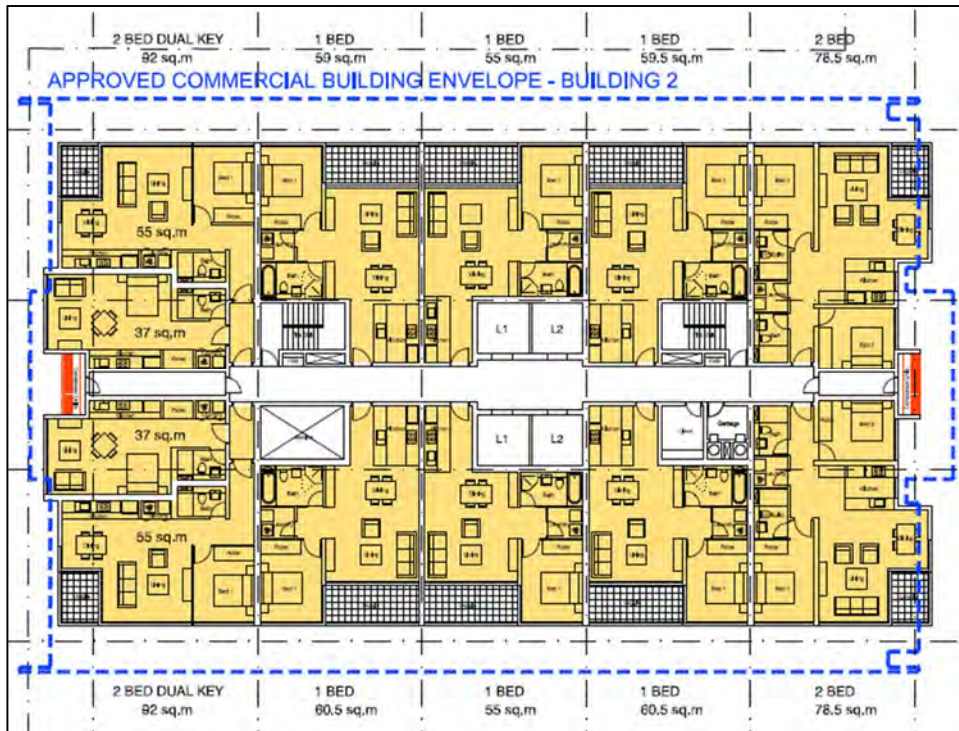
Building 2 Proposed typical tower floor Levels with Approved building footprint overlay
